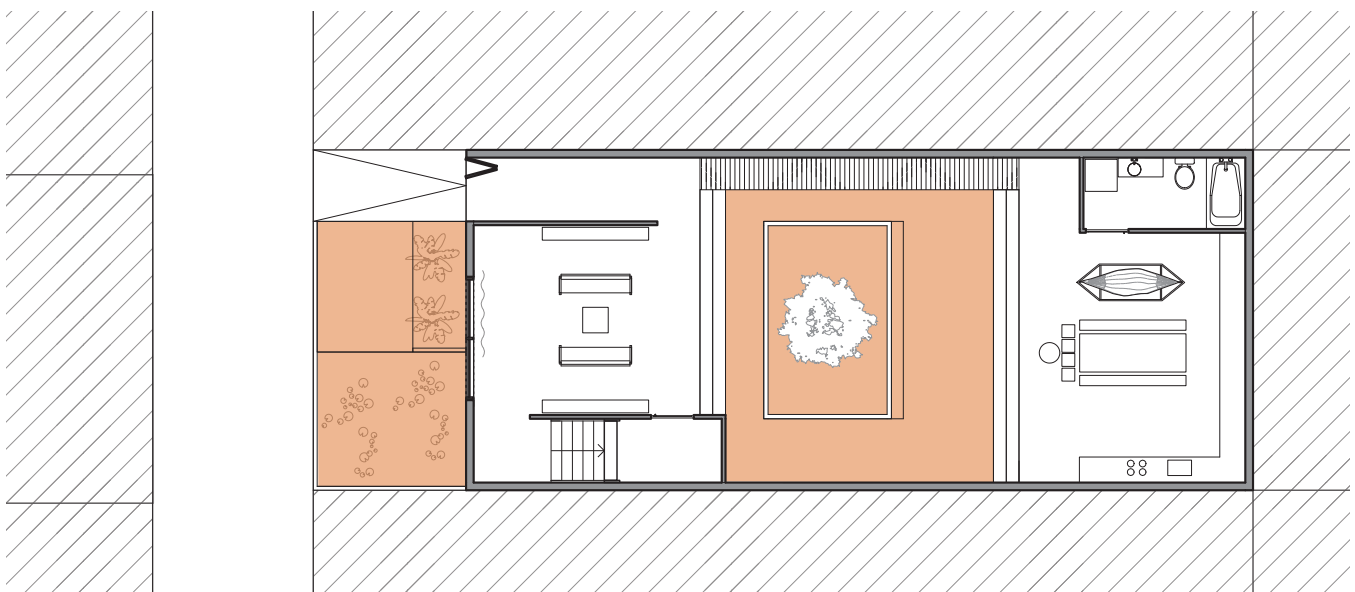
Plan of a new flood-adaptive alleyway house in flood condition.
